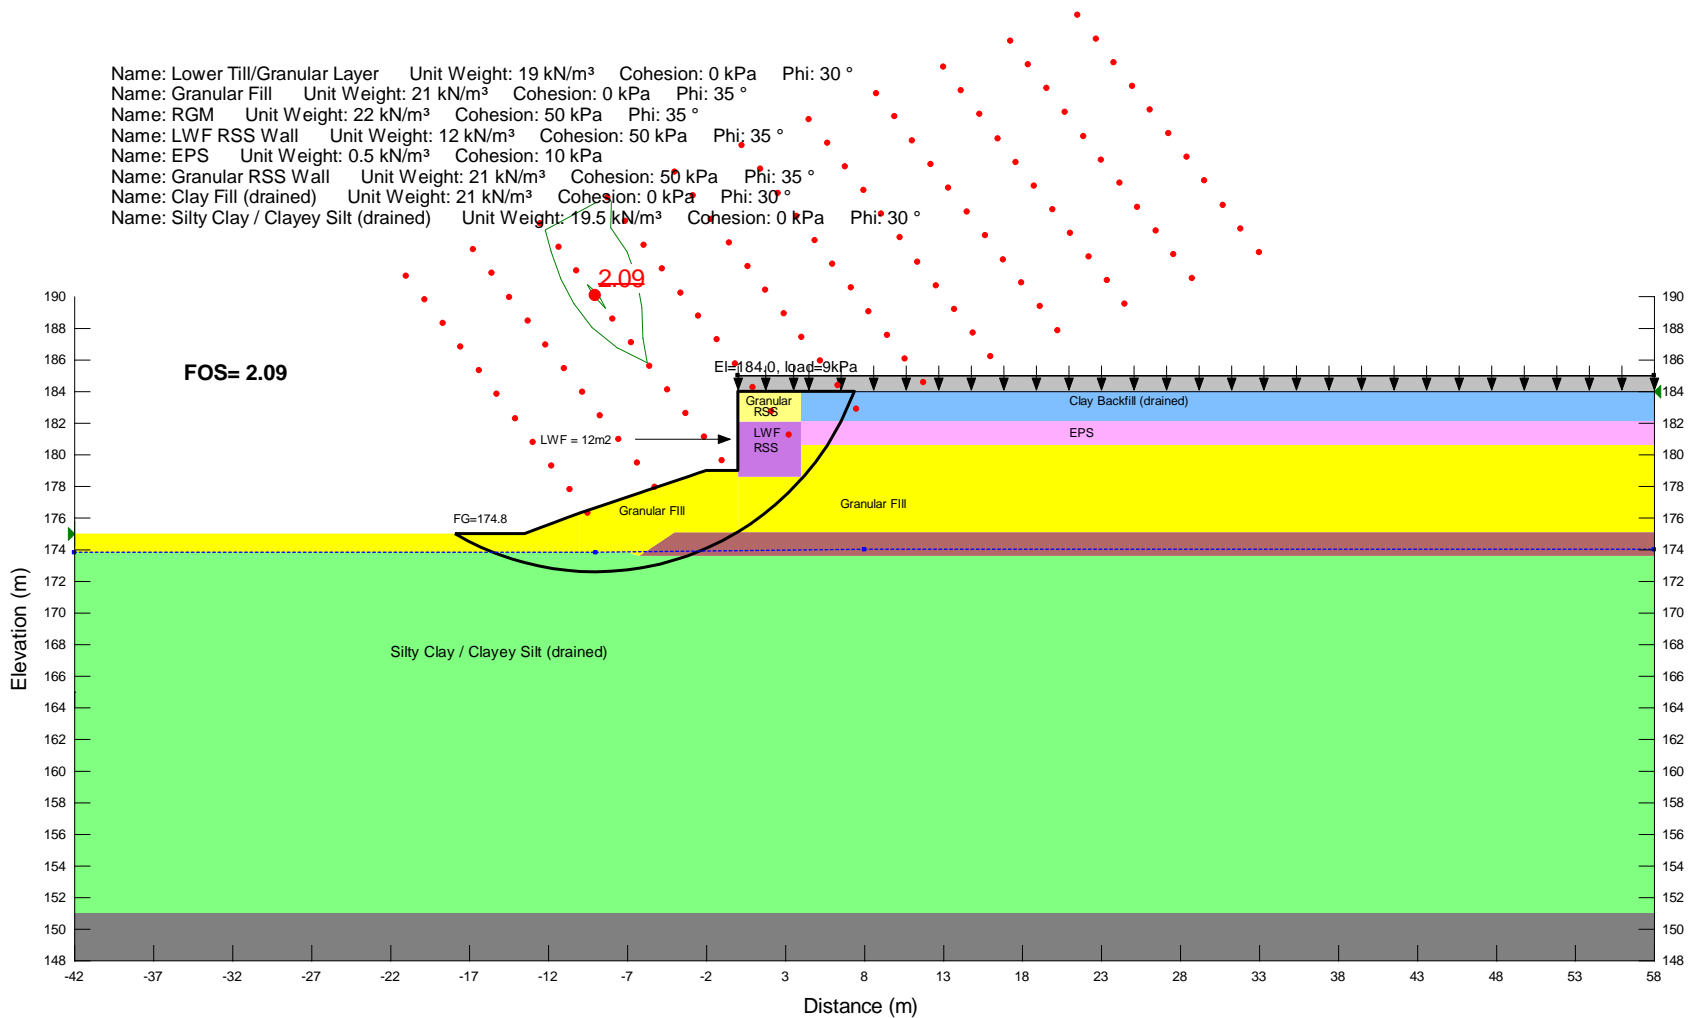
Slope Stability – End of Construction – South Abutment – Return Wall – Station 10+450L Hwy 401
